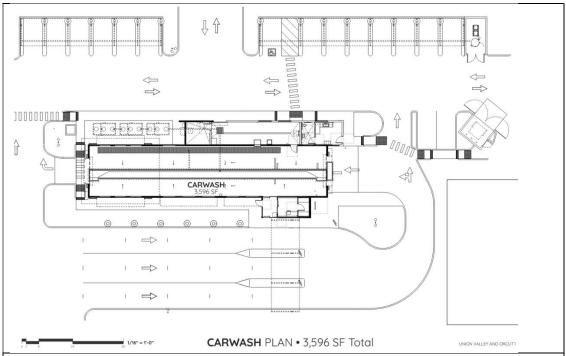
3,800 Sq. Ft. Floor Plan 3,800 sq. ft. floor plan included in the January 21, 2025 resubmittal (and incorrectly labeled 3,596 sq. ft.)
